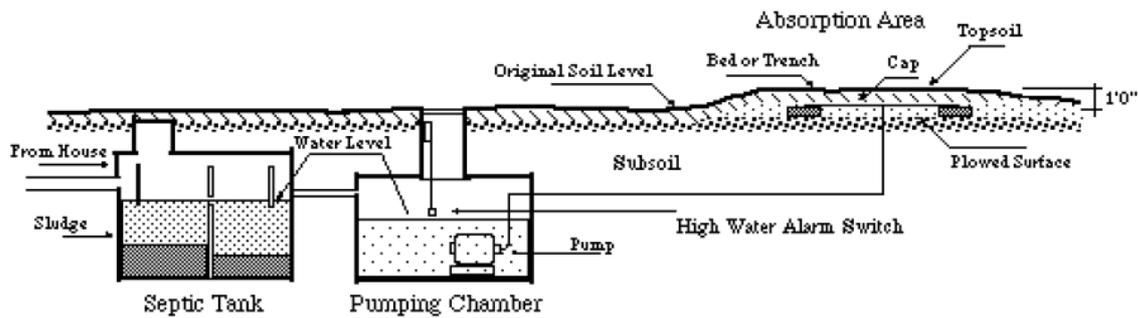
Illustration shallow trench section view (Yeang & Woo, 213.)
